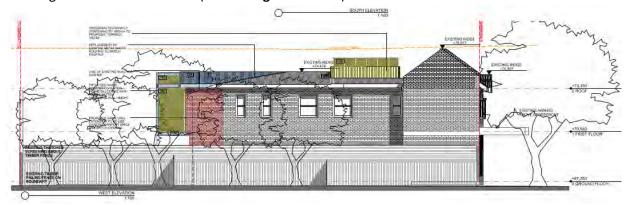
West Elevation as viewed from the rear of properties fronting Yanko Avenue
